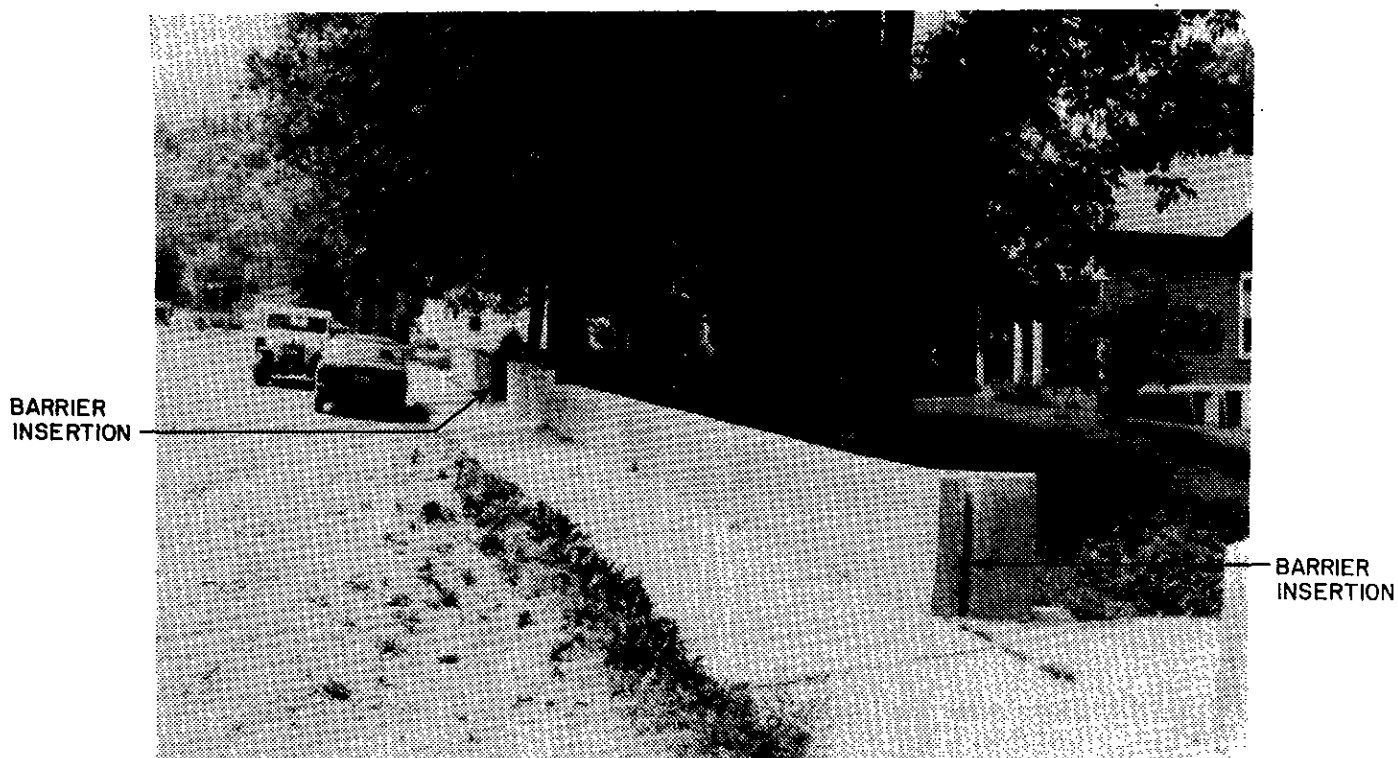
Floodwalls equipped to accept barriers across openings. Ouray, CO.
